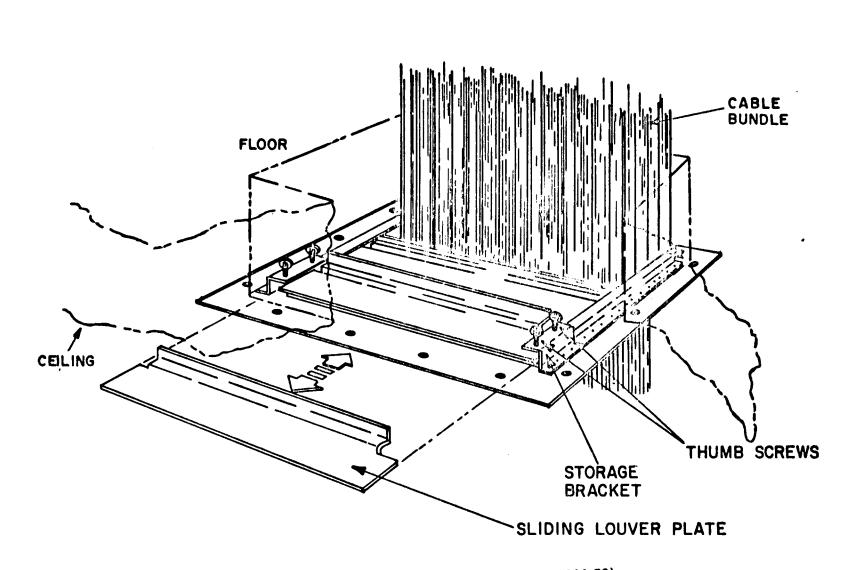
Adjustable Cable Hole Ceiling Plate (See ED-92116-72)
